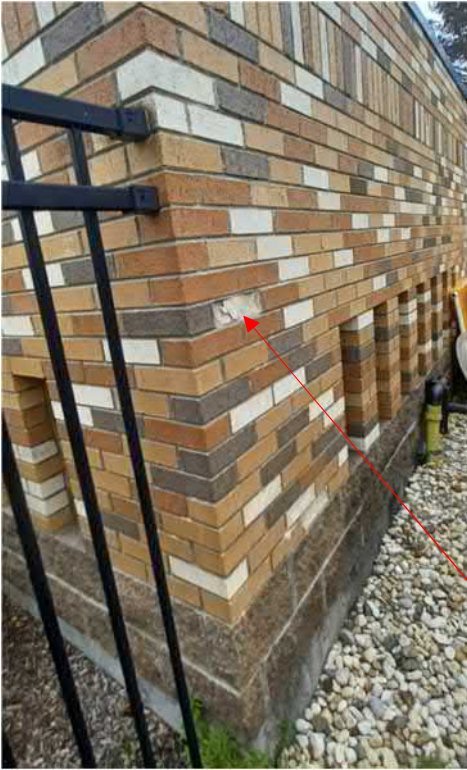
Spalling / popping Brick, in need of replacement.
